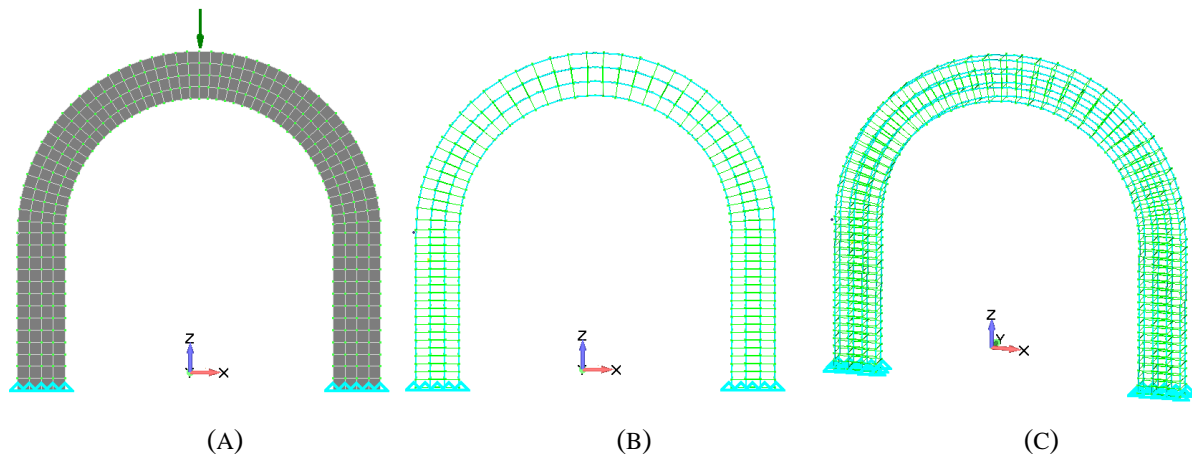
ARCH-SHAPED RC FRAME. MESH DETAILS OF (A) HEXAHEDRAL AND (B-C) INITIAL REBAR ELEMENTS.
